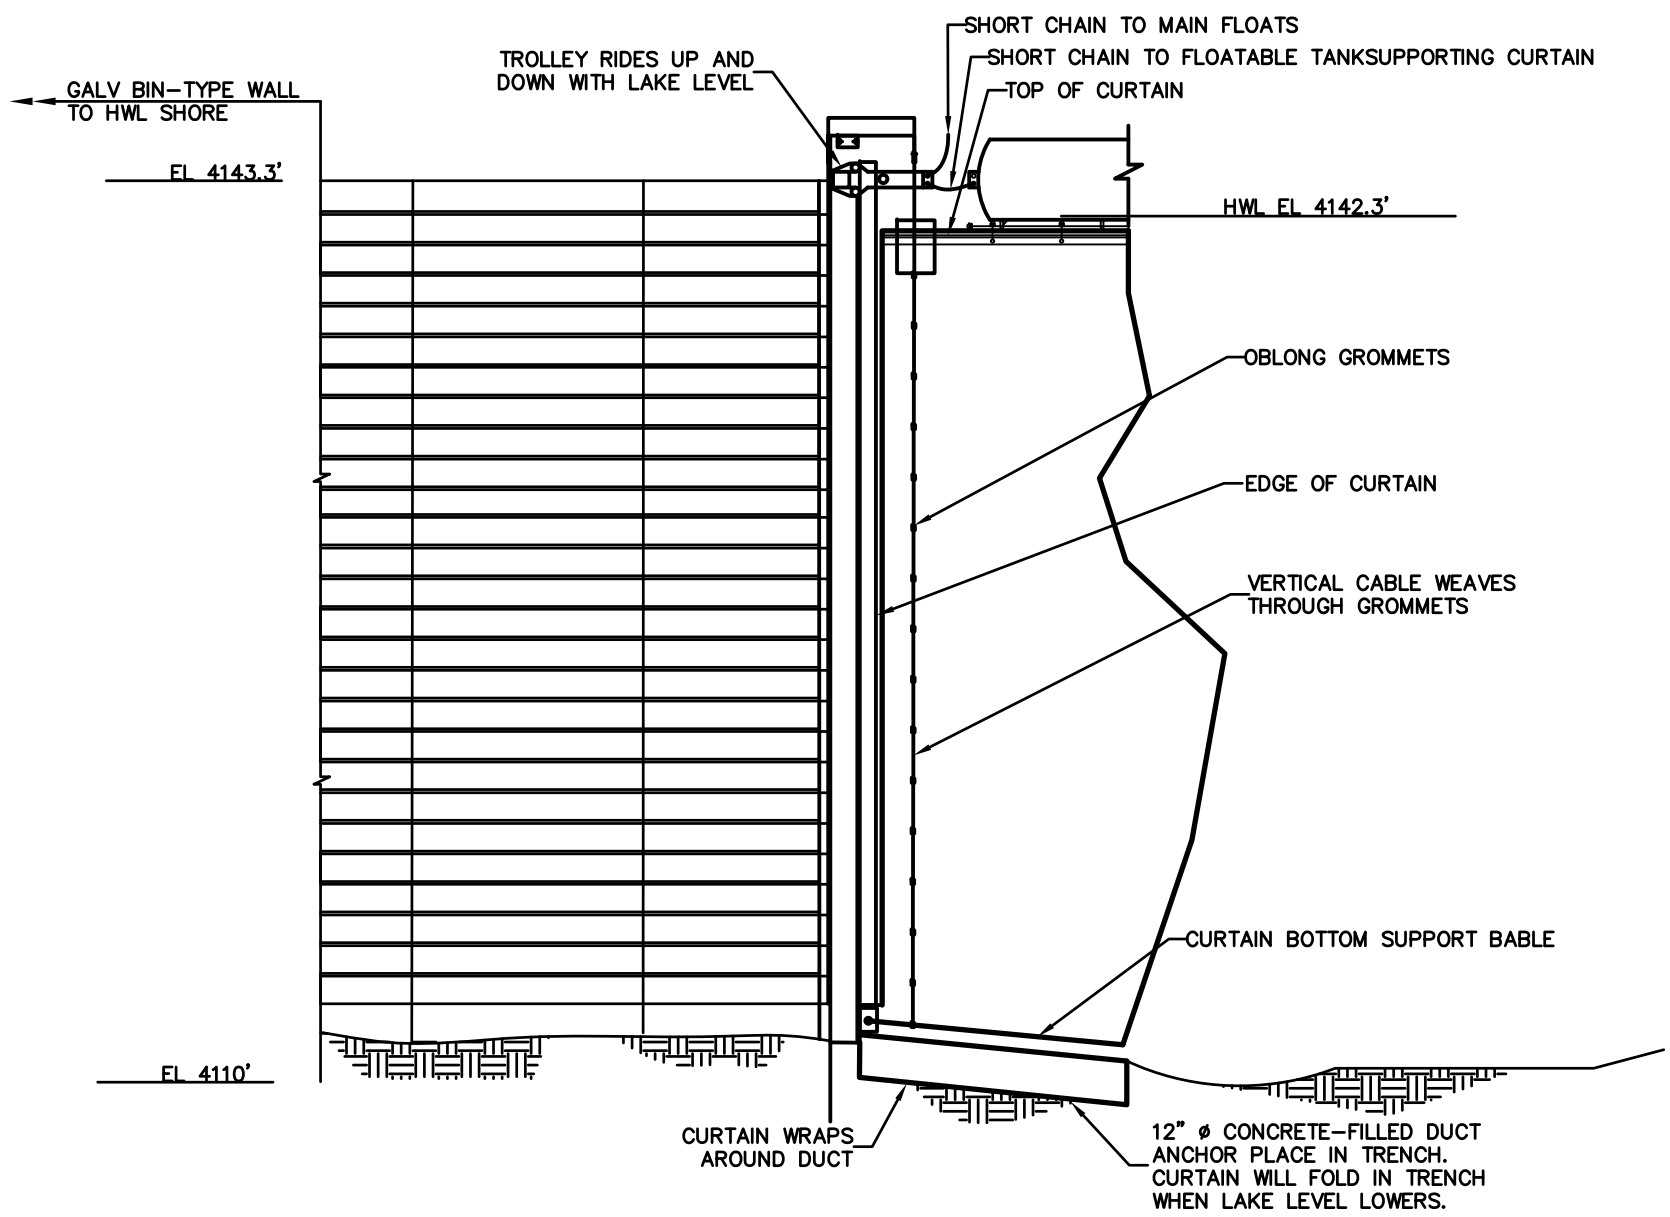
PLAN VIEW OF CARIBOU INTAKE THERMAL CURTAIN
